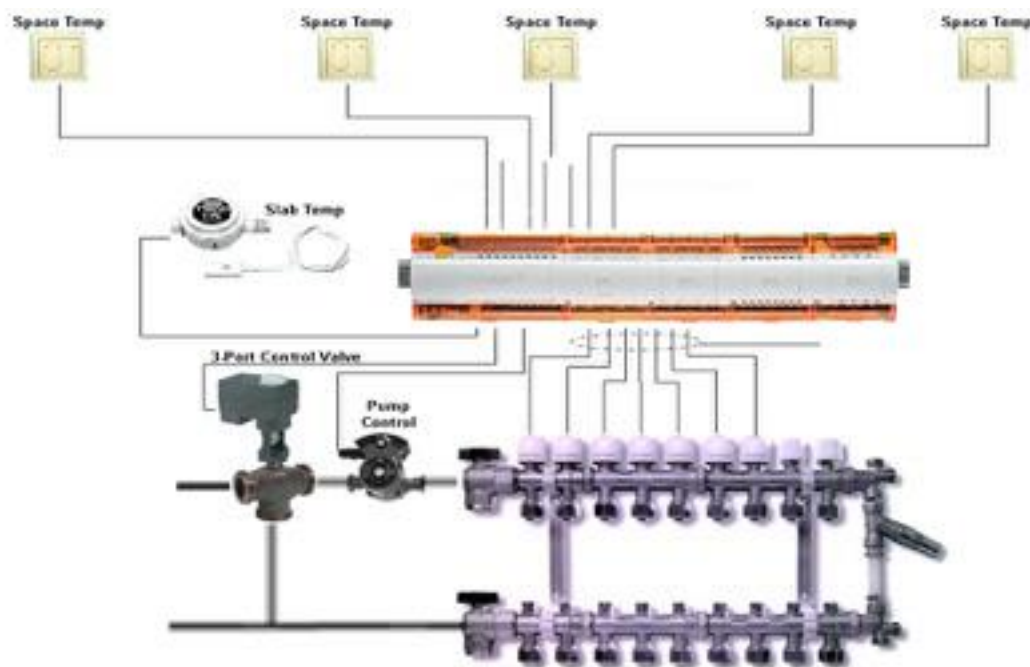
UNDER FLOOR HEATING LAYOUT
